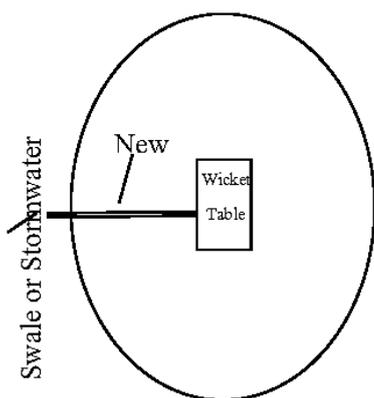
Shows a drain that shall run from the centre of the wicket table, connecting into a swale or stormwater pipe
